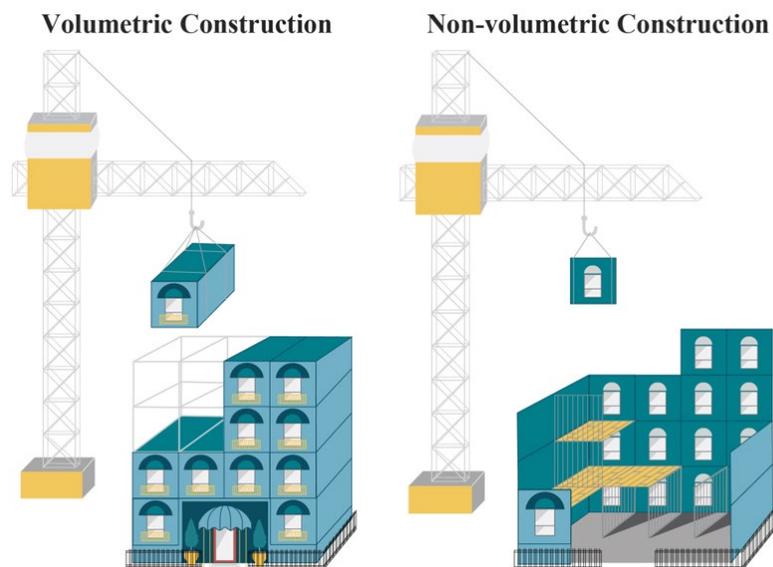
Volumetric modular construction where factory-built discrete units are being stacked on site (left) as opposed to non-volumetric panelized construction (right). *Source:* (BuildingGreen, Inc. 2018)
